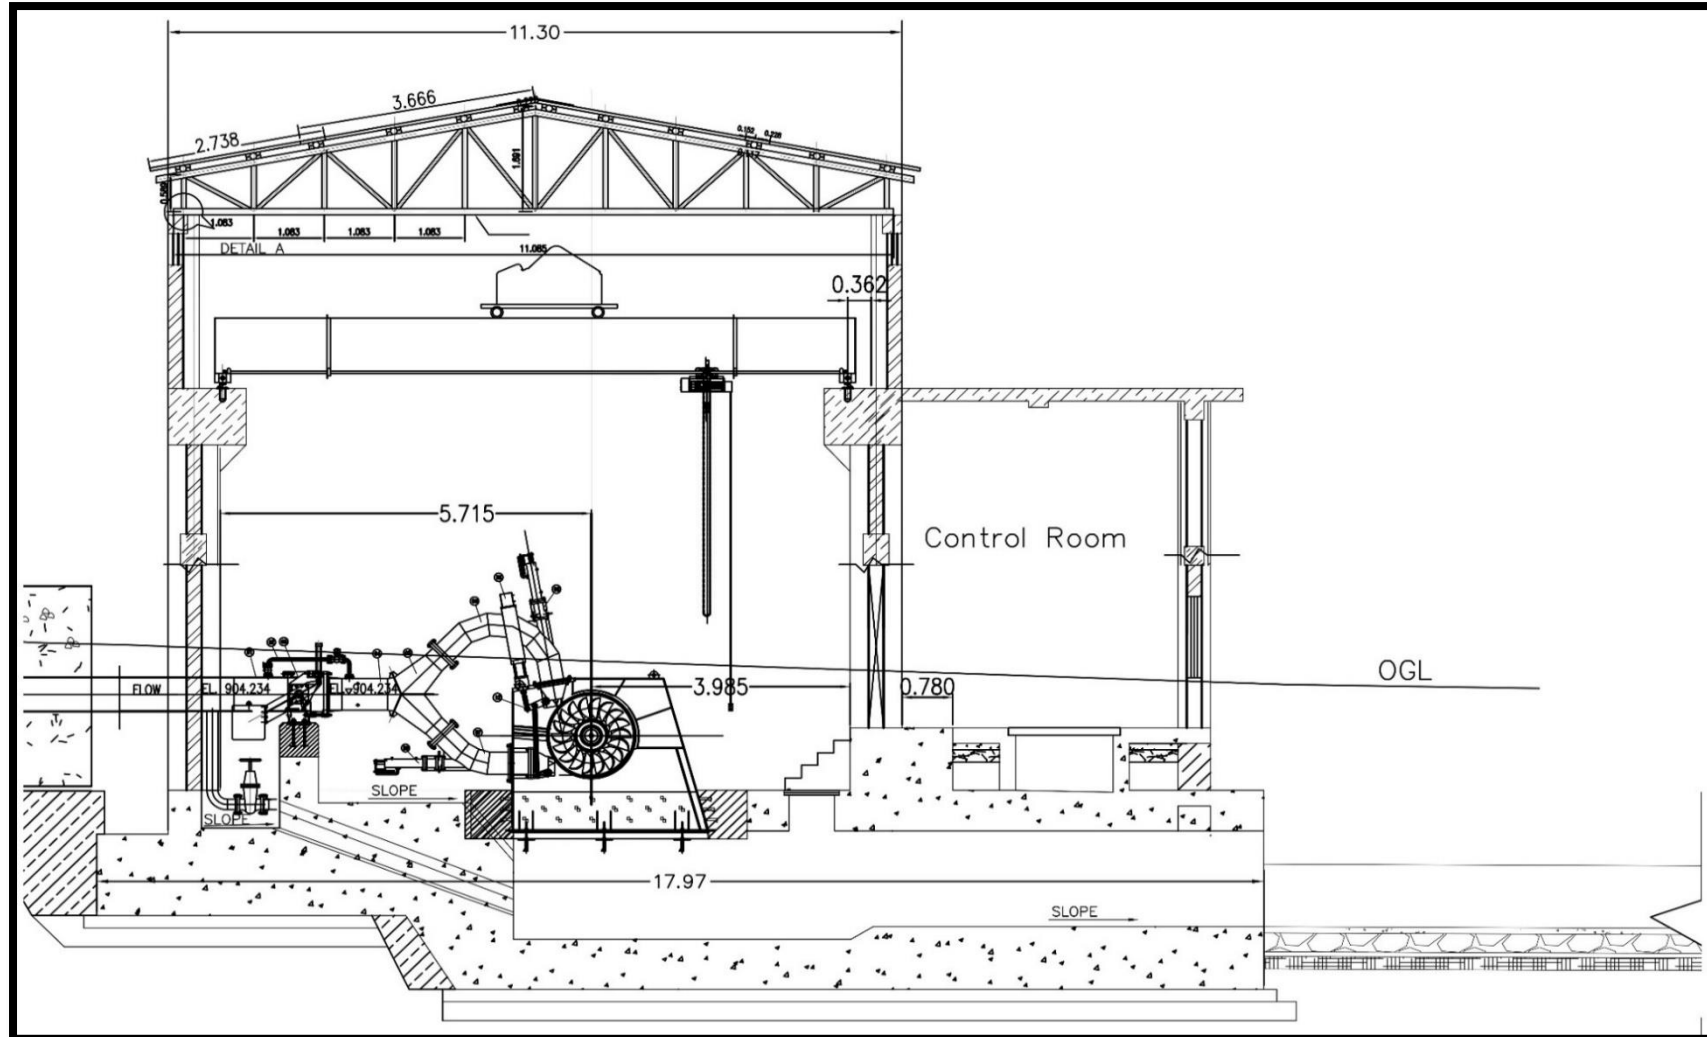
Typical powerhouse section with Tailrace for Pelton Turbine
